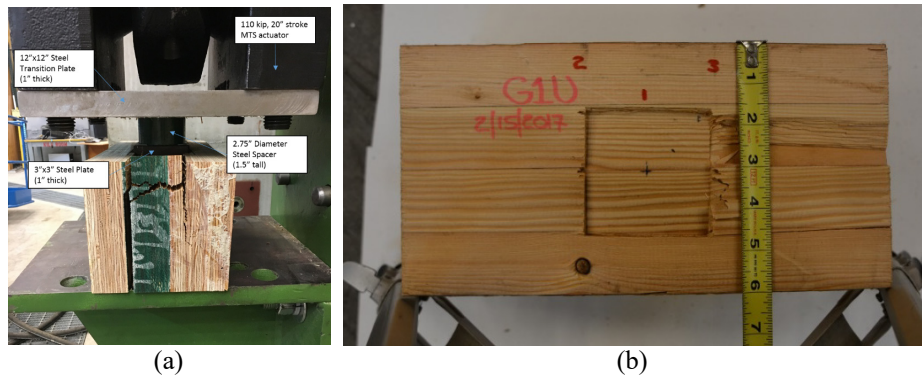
Compression test setup: (a) LVL specimen at failure; (b) failure of unreinforced Glulam specimen
